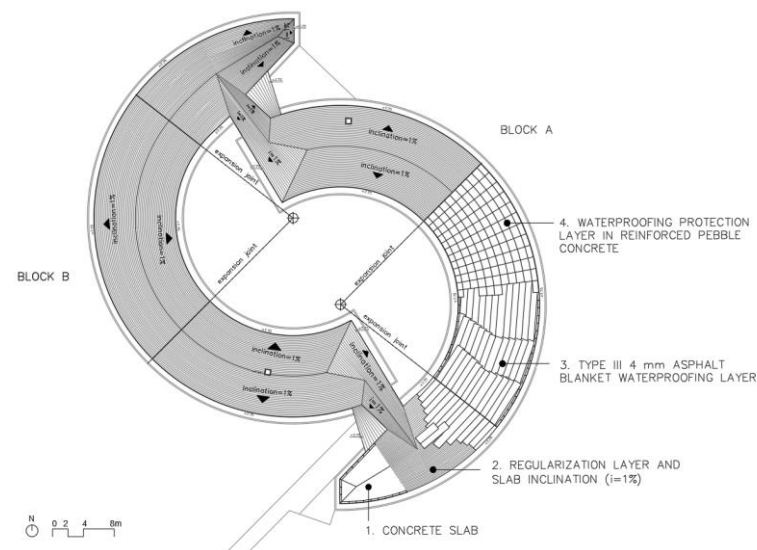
Executive roof waterproofing project and drainage diagram. Source: Oscar Niemeyer Planning Center—CEPLAN/UnB. Source: the authors.
